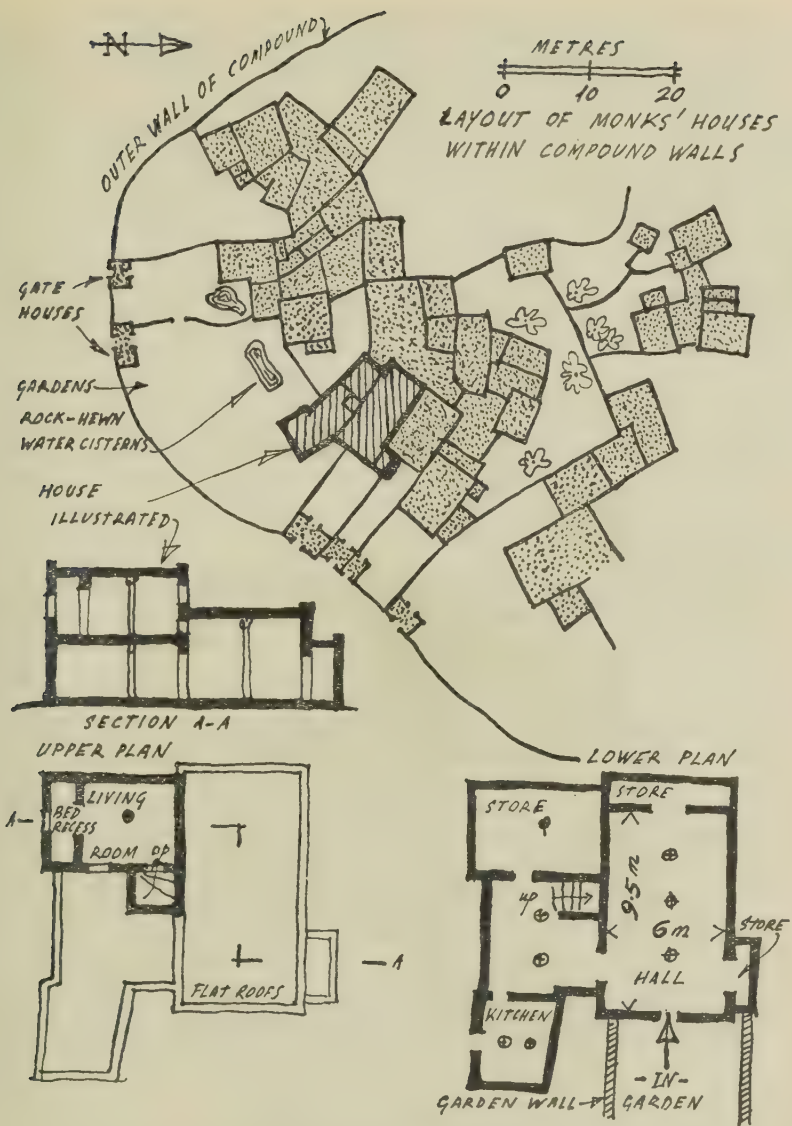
PLAN OF PART OF ONE OF THE COMPOUNDS, SHEWING THE BACK-TO-BACK HOUSES, WITH INDIVIDUAL GARDENS SURROUNDED BY A COMPOUND WALL WITH GATES. PLANS AND SECTIONS OF A TYPICAL HOUSE
